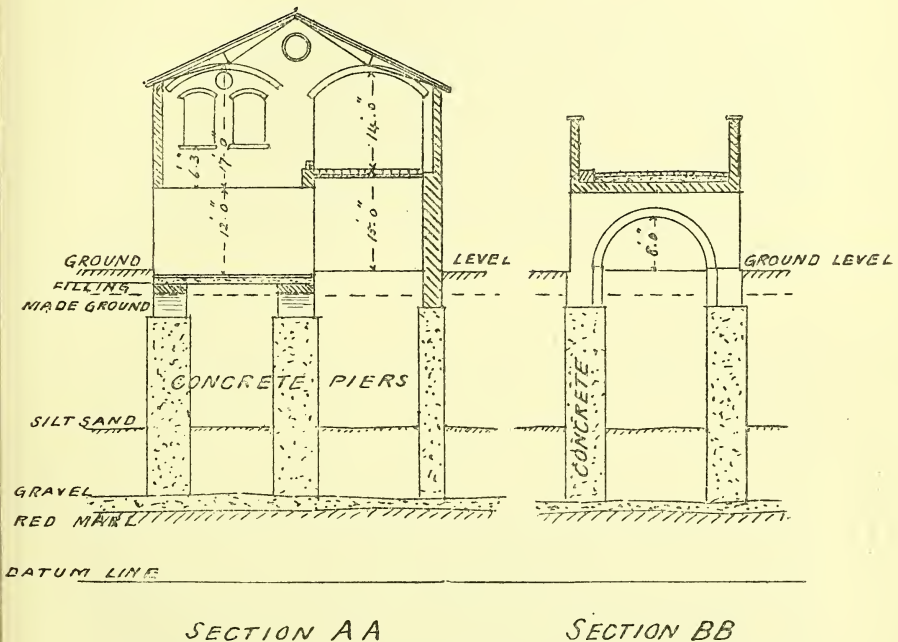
Cross Section : A A through Destructor Building, and B B through Approach Roadway.
